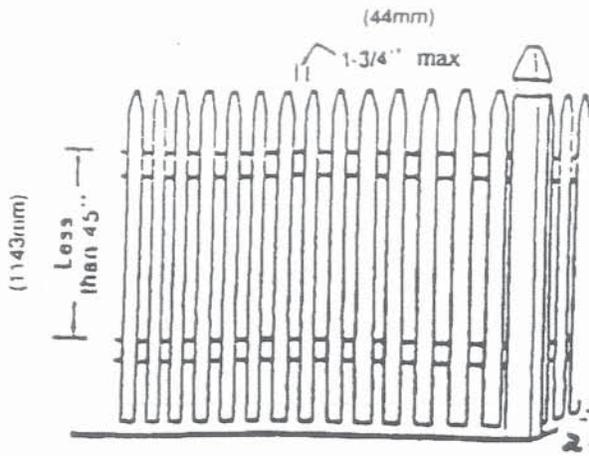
FIG. A IF HORIZONTAL MEMBERS ARE LESS THAN 45° APART, THE SPACE BETWEEN VERTICAL MEMBERS SHALL NOT EXCEED 1-3/4".
